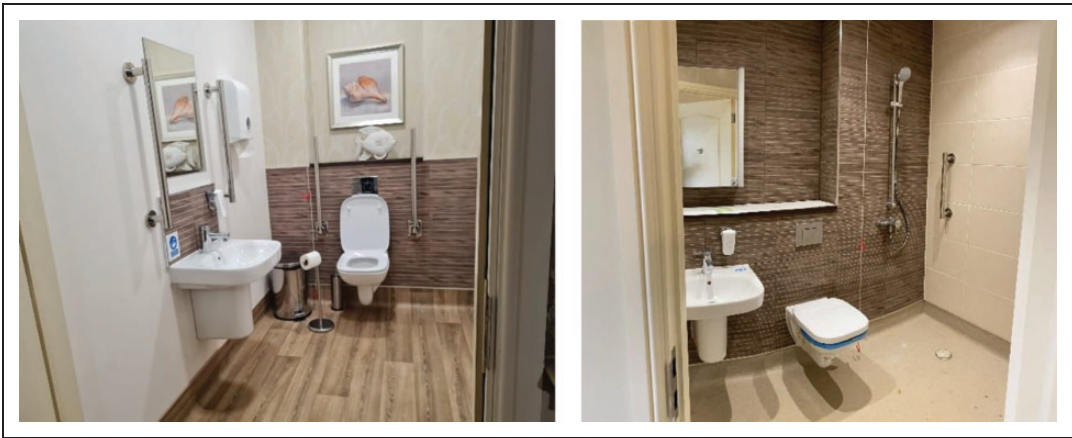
Selection of nonslippery light color floor in bathroom area. Photos provided by Natta Building Company Ltd, UK.
